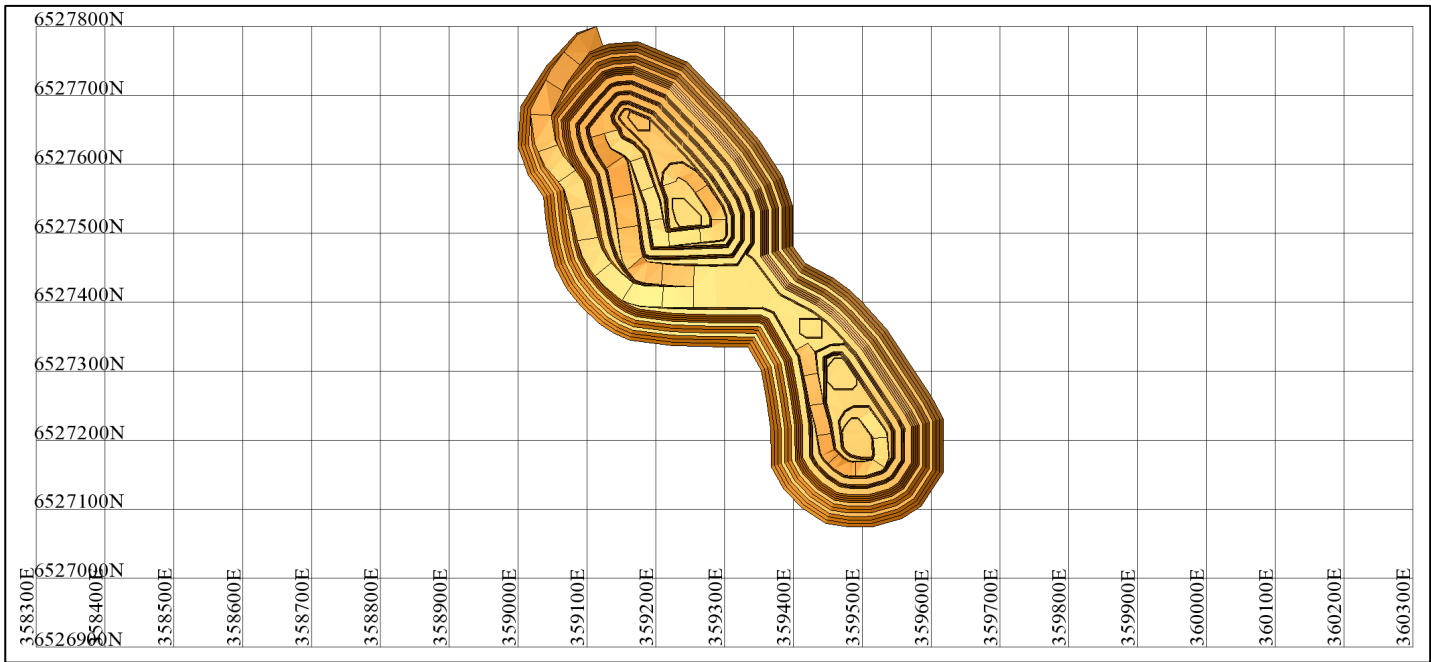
Theia stage 1 pit design – Plan view – Production Case
